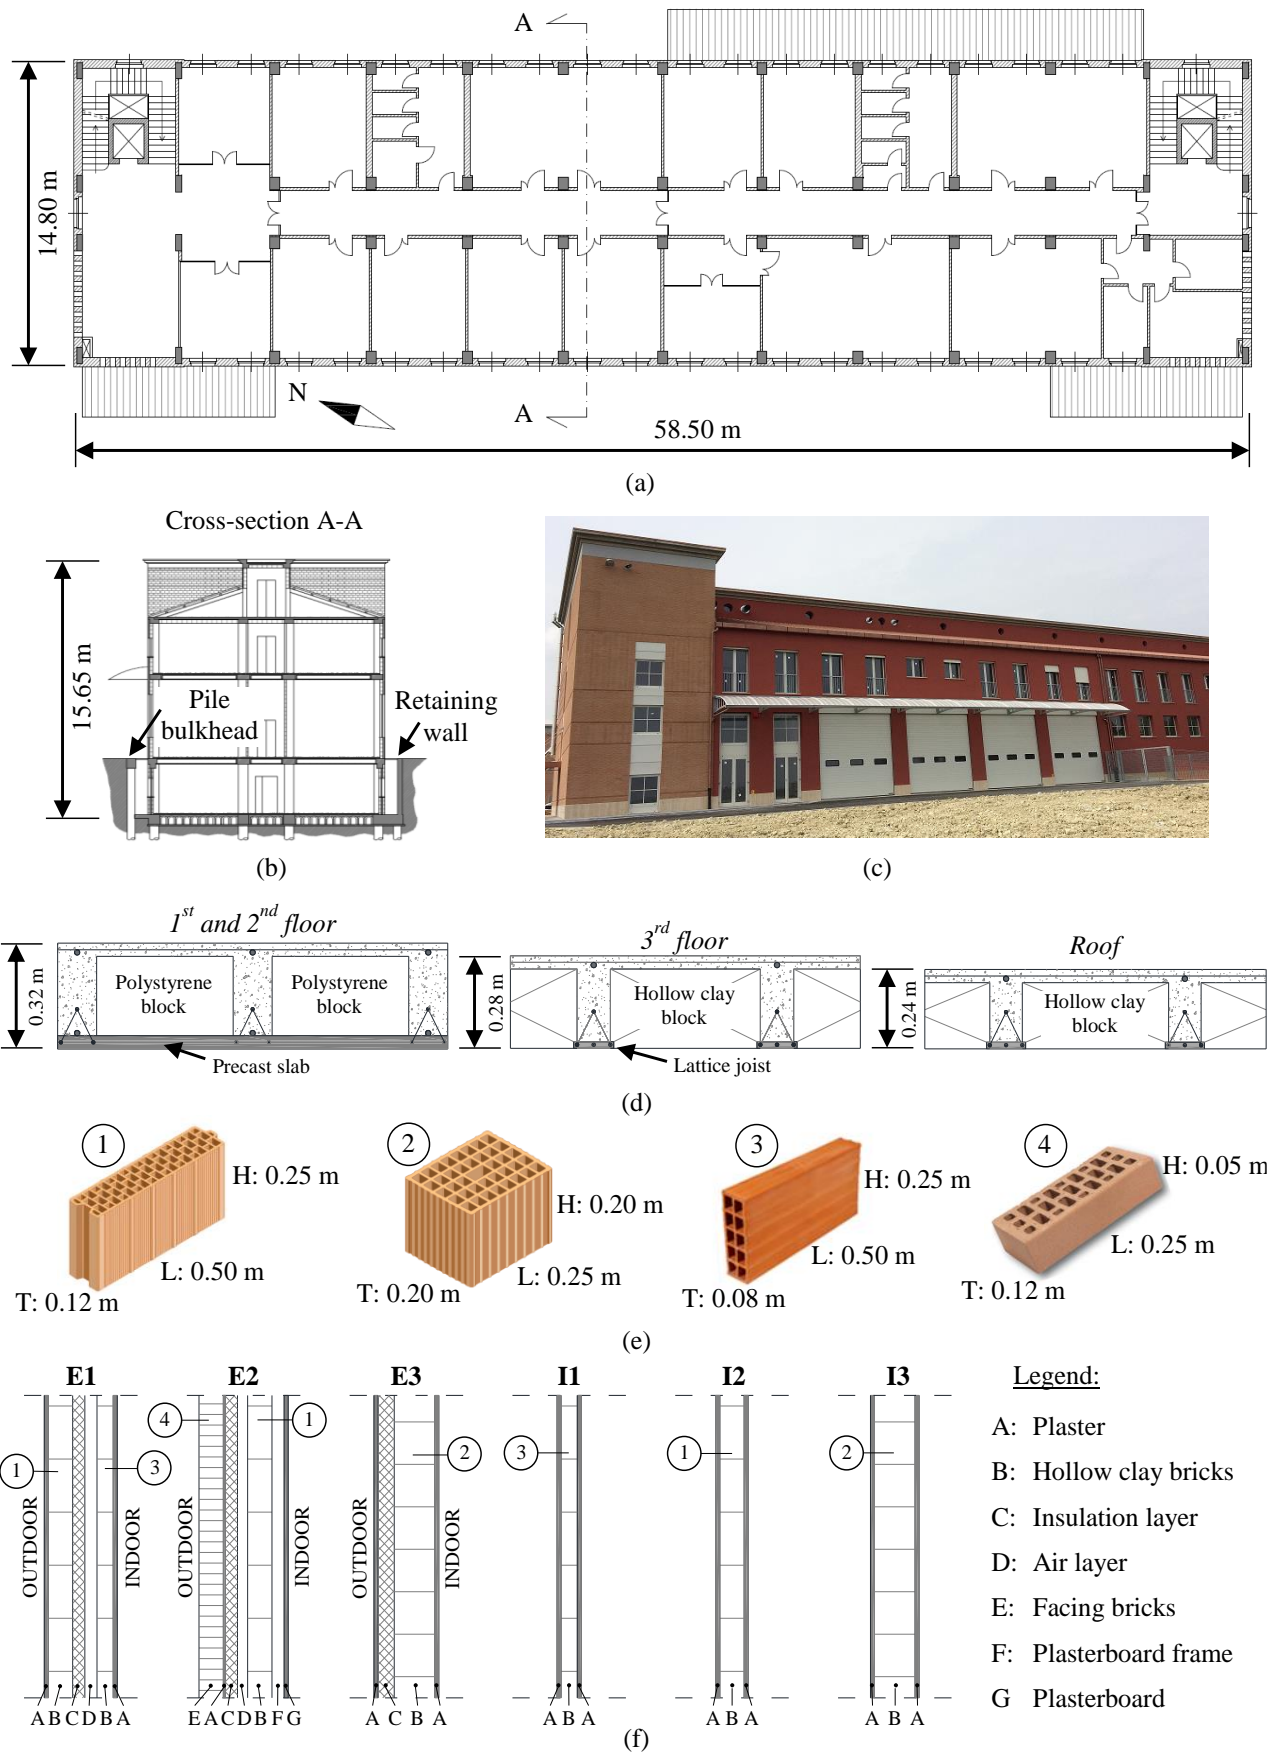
Building case study: (a) plan of the 2<sup>nd</sup> floor, (b) transverse cross-section, (c) external view, (d) floor slab typologies, (e) bricks adopted for external and internal infills, (f) external and internal infill typologies.
